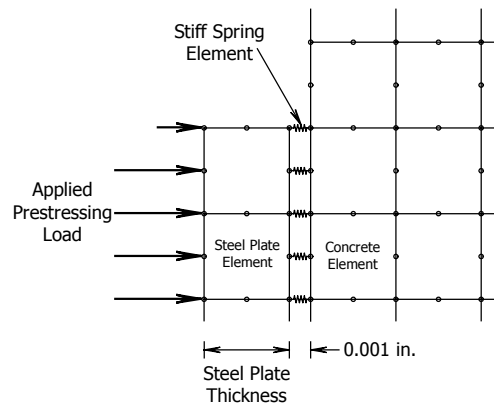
SPRING CONNECTION BETWEEN BEARING PLATE AND CONCRETE ELEMENT
